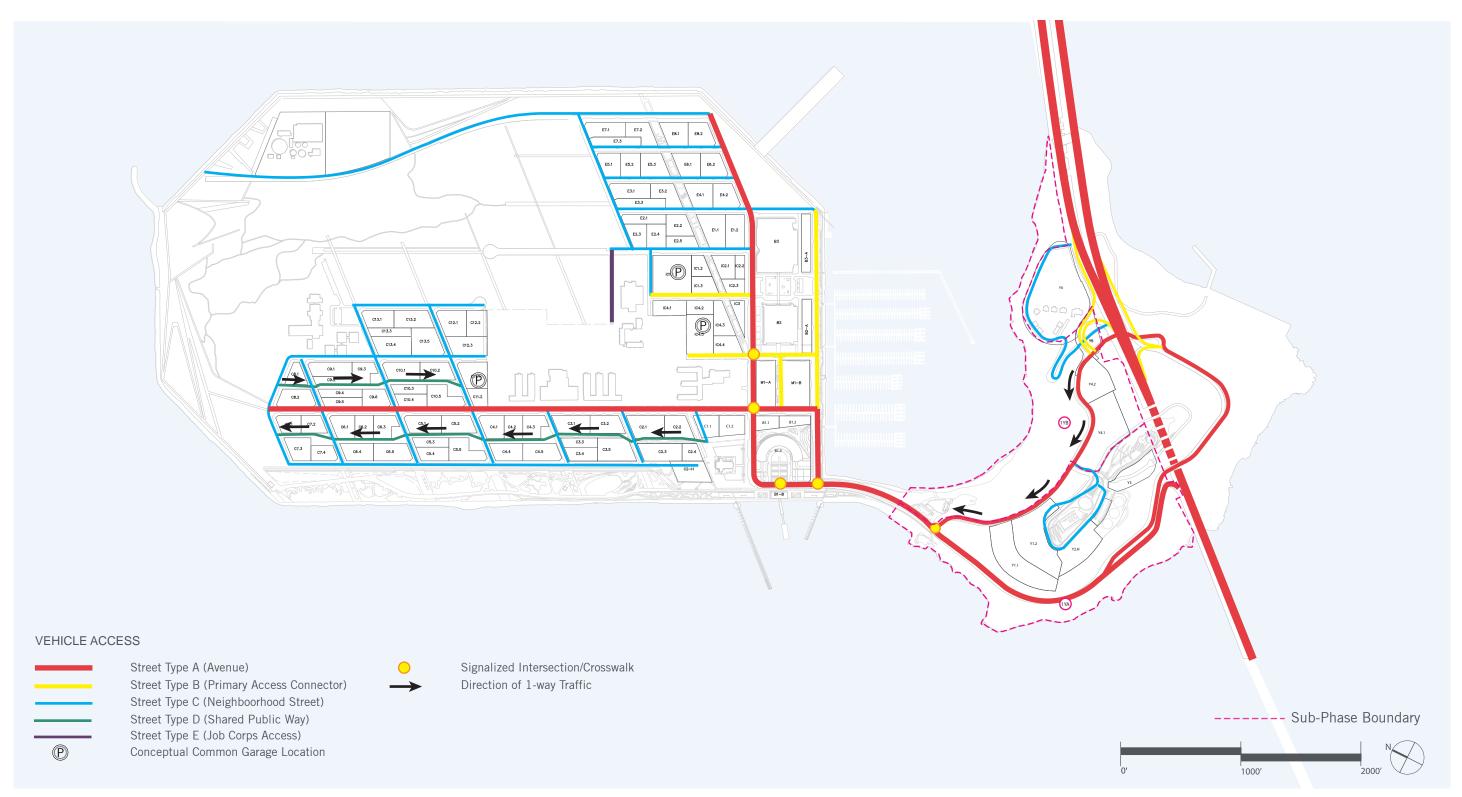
VEHICULAR NETWORK SITE PLAN
